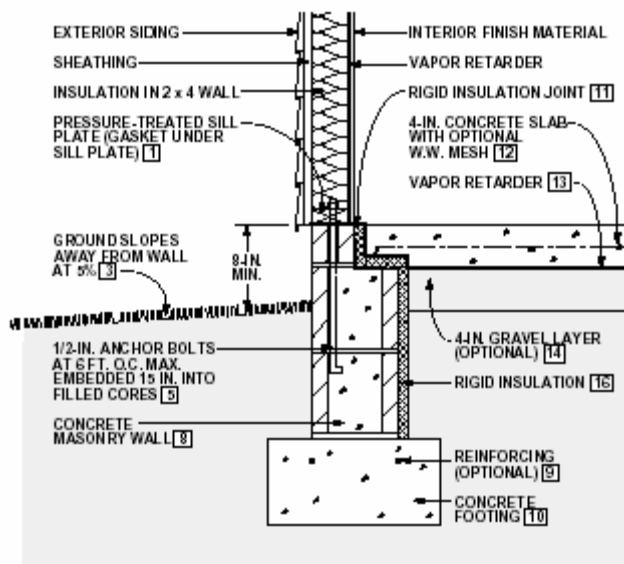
illustrates a slab-on-grade foundation with a concrete masonry foundation wall. Rigid insulation is placed vertically on the interior face of the foundation wall and extends into the joint at the slab edge. Because the floor slab rests on the ledge of the foundation wall, it is important to compact the soil beneath the slab to minimize settlement and cracking of the slab. This approach utilizes a 2 x 4 above-grade wood frame wall.
